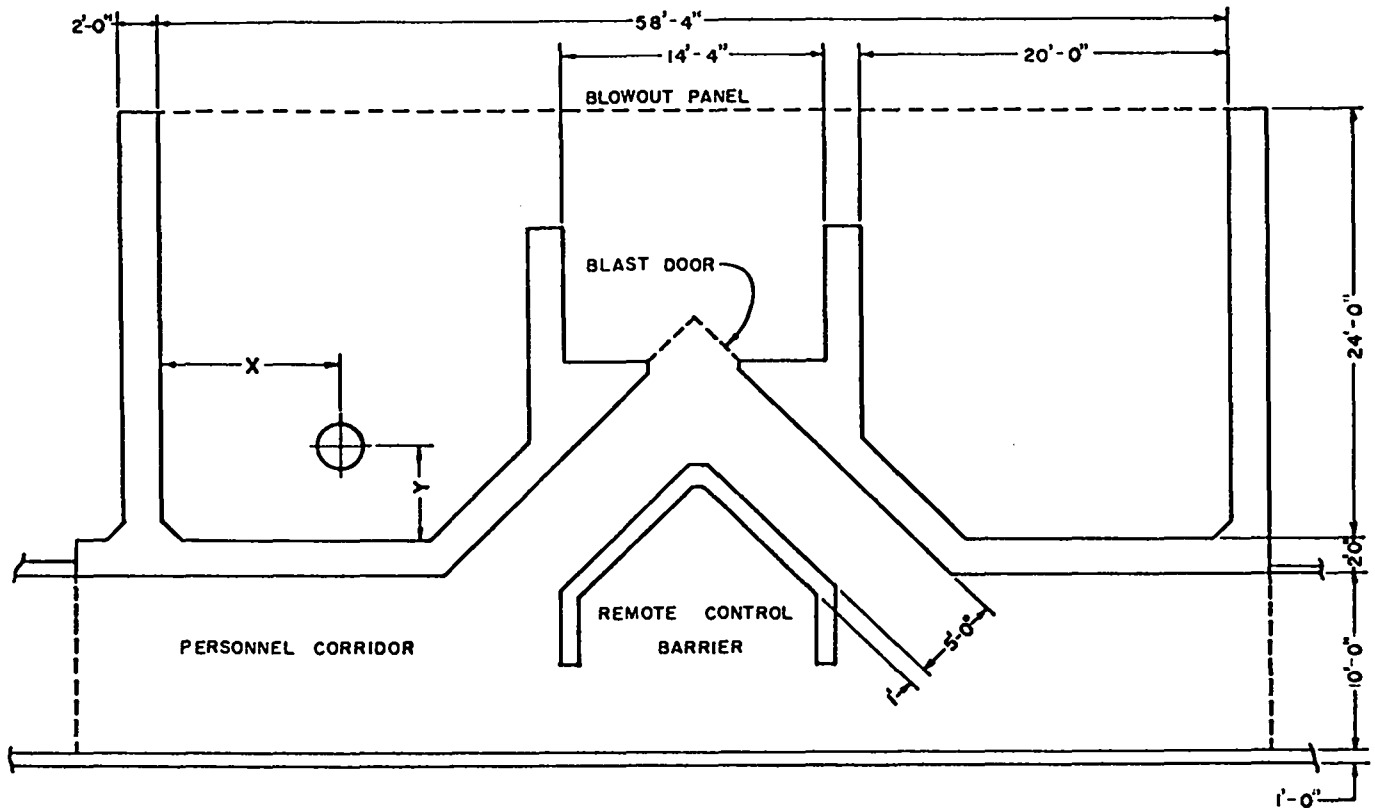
Floor plan of a typical processing bay pair. X and Y coordinates are used to indicate charge location.
